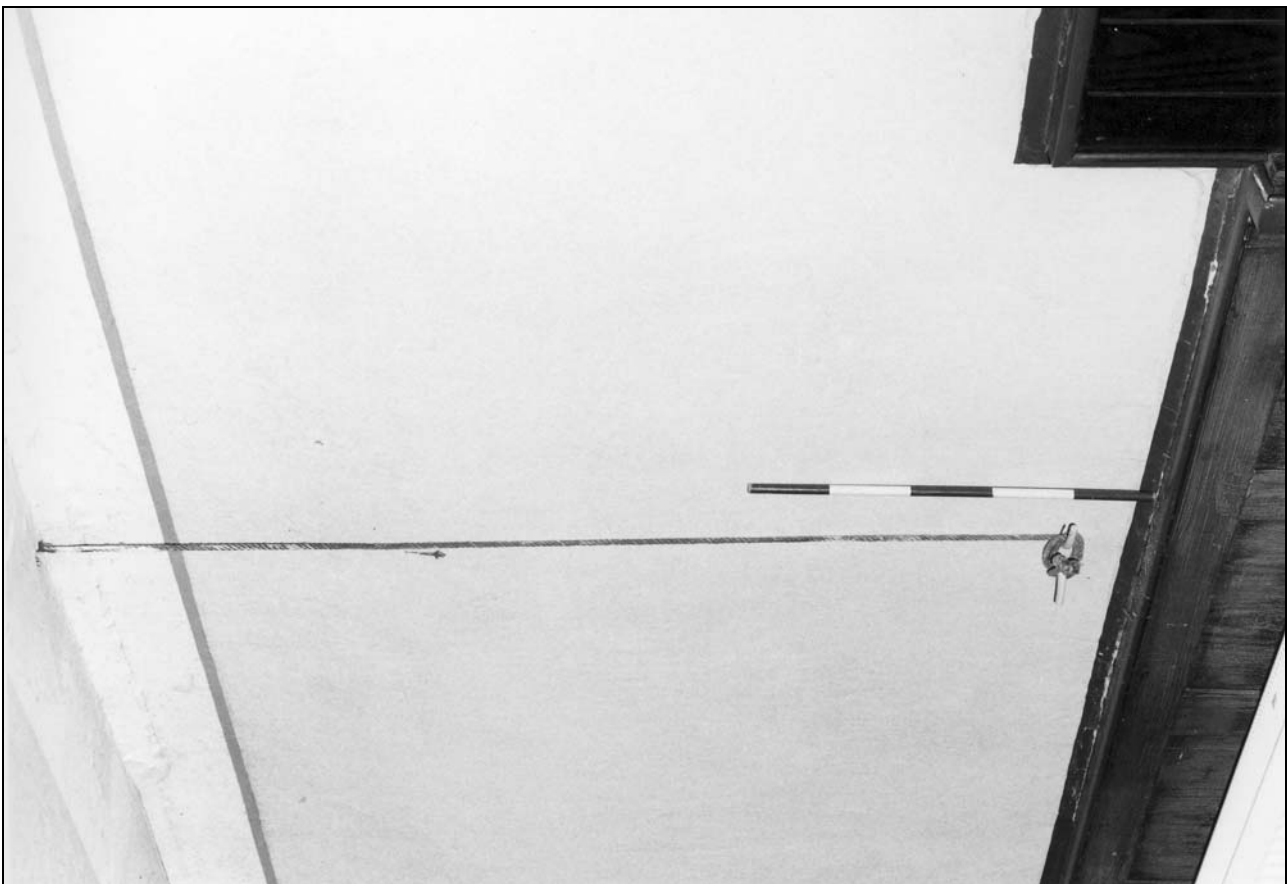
Detail of rope controlling ventilator above ceiling, east side of gallery (film 3, frame 11)
